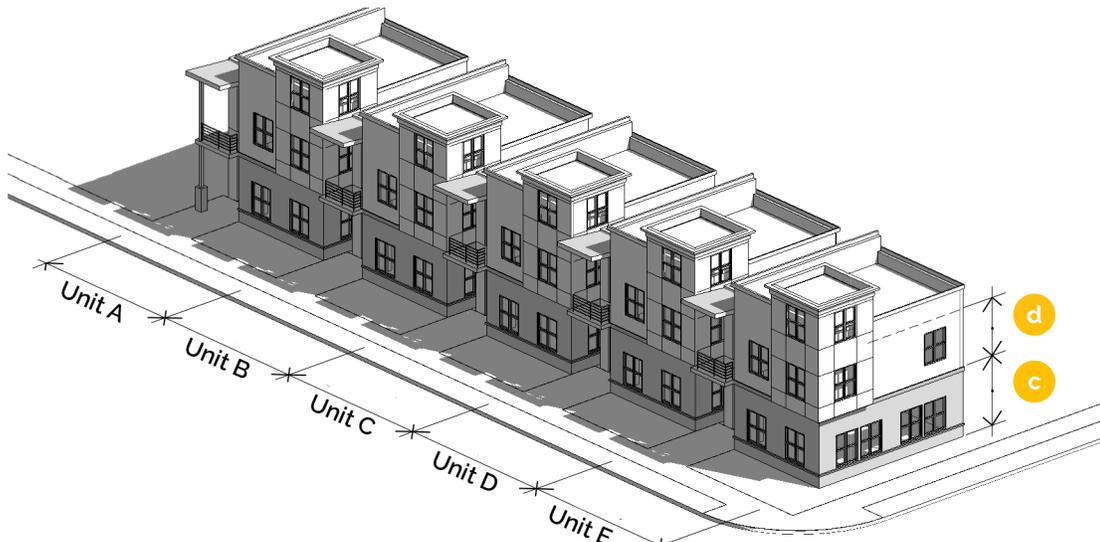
B.2 - Attached House Façade Type - Flat Roof
